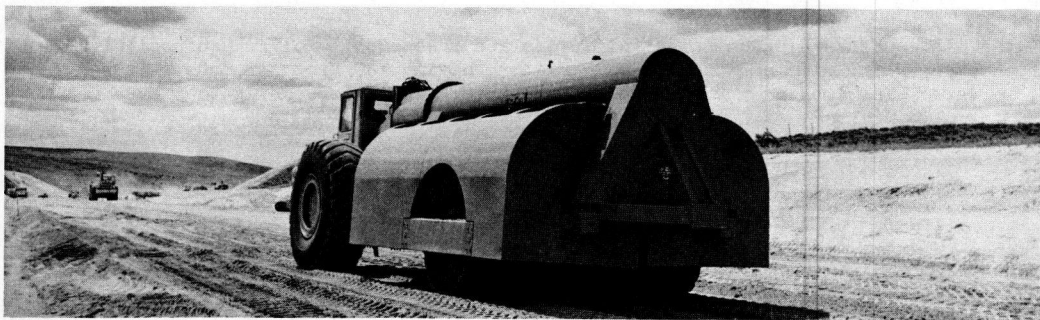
A. Fifty-ton 4-wheel self-propelled pneumatic-tired roller equipped for loading with sand or water ballast or both. Weight range is from 37,000 lb (empty) to 115,000 lb (fully loaded).
